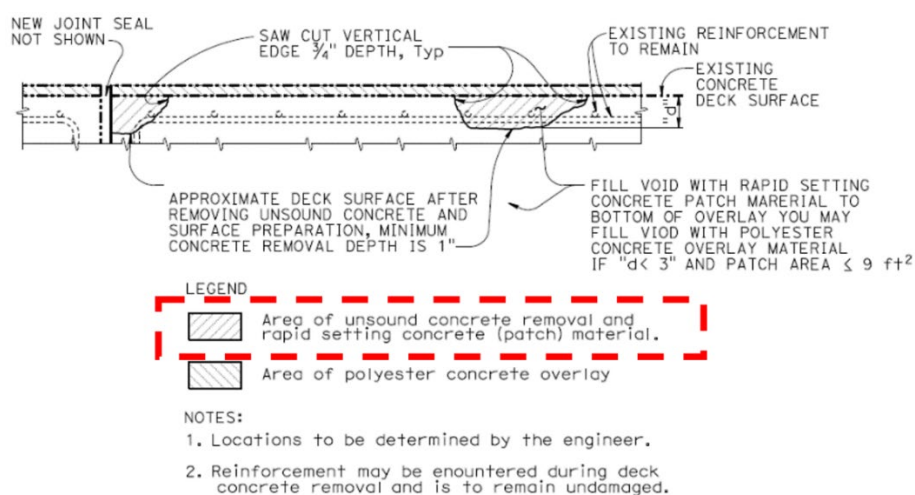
Contract Plan Showing Details of Unsound Concrete Removal
